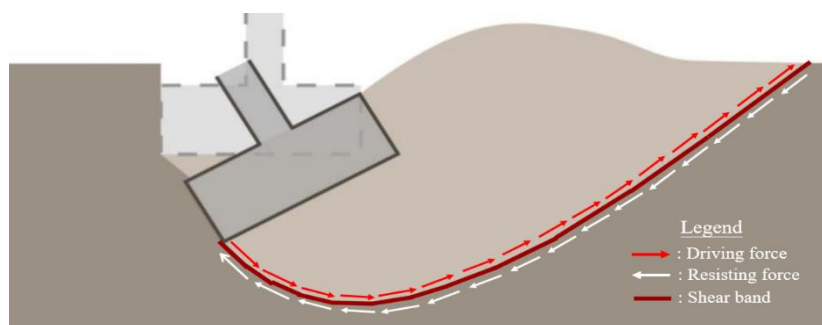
General shear failure of the strip foundation under asymmetric and unstable conditions.
